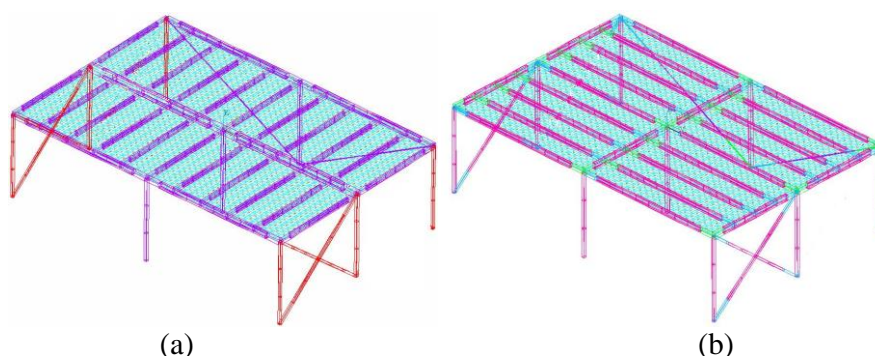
The steel buildings prototype: (a) The floor joists parallel to the lateral load. (b) The floor joists perpendicular to the lateral load.
